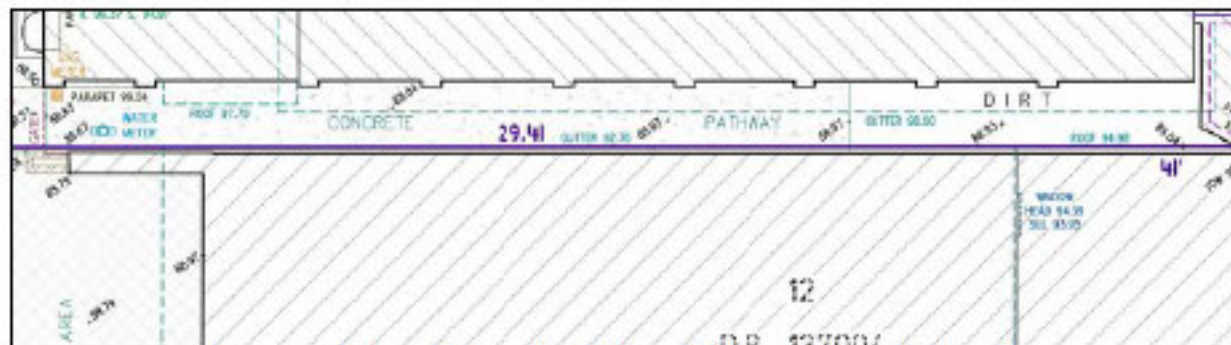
Existing wall of south-adjacent neighbour – built to the boundary
